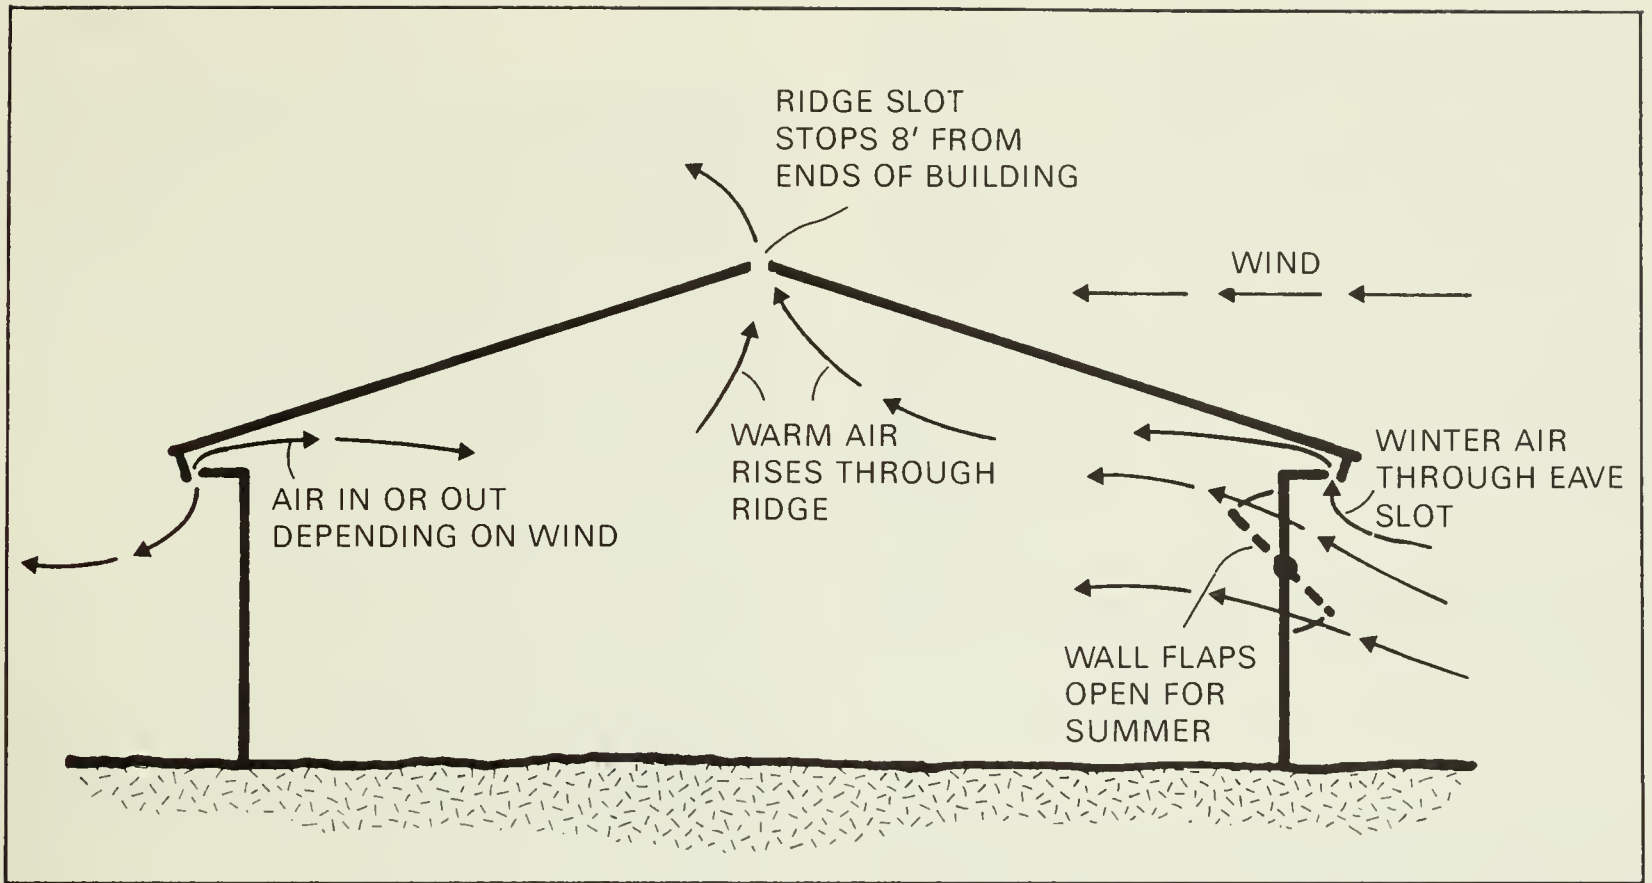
Wall flaps, and eave and ridge openings are used for ventilation of open-end or closed sheds.
